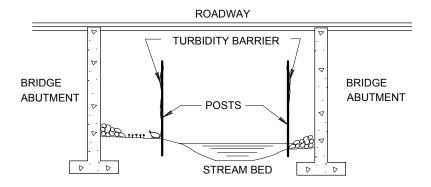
TURBIDITY BARRIER DETAIL SHOWING TYPICAL PLACEMENT AT STRUCTURES
